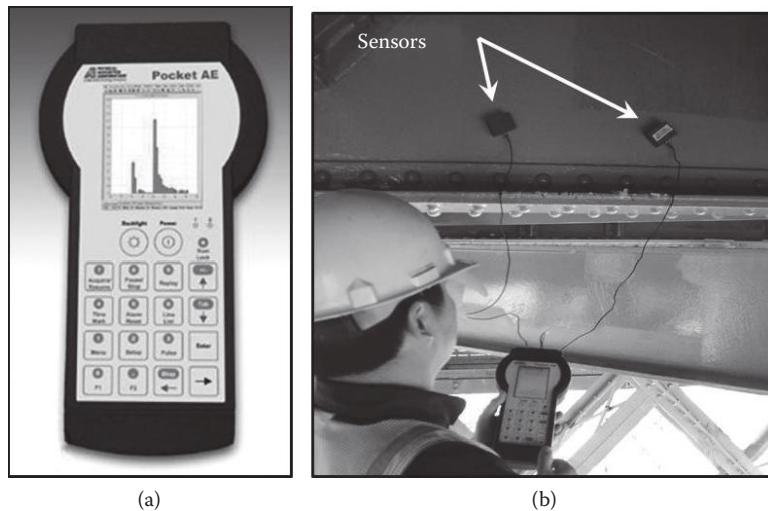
(a) Handheld two-channel acoustic emission (AE) instrument and (b) application of the AE sensor on a steel bridge. (Image courtesy of Mistras Corp.)
